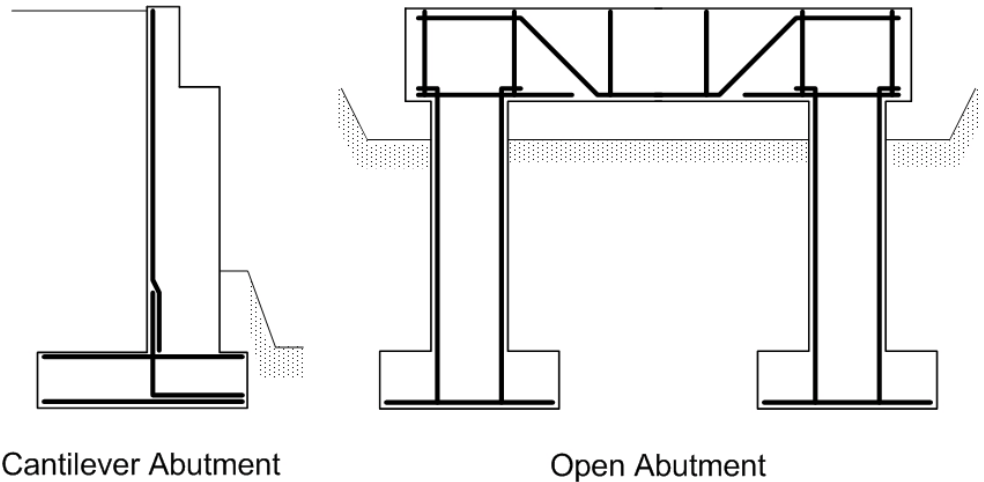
Primary Reinforcement in Concrete Abutments
